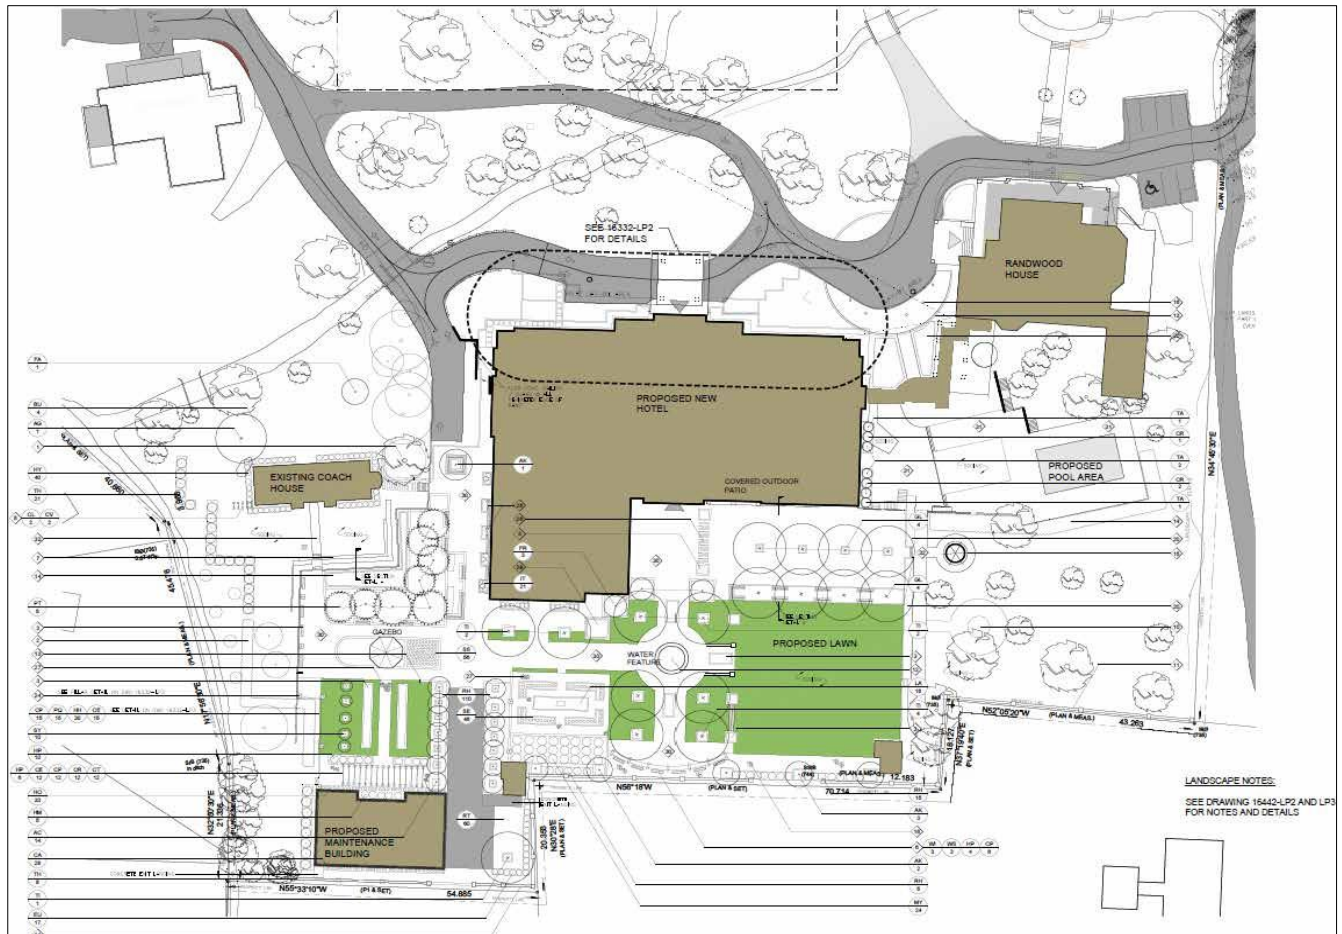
General Arrangement Landscape Plan: New planting and incorporation of preserved plants around the hotel.
